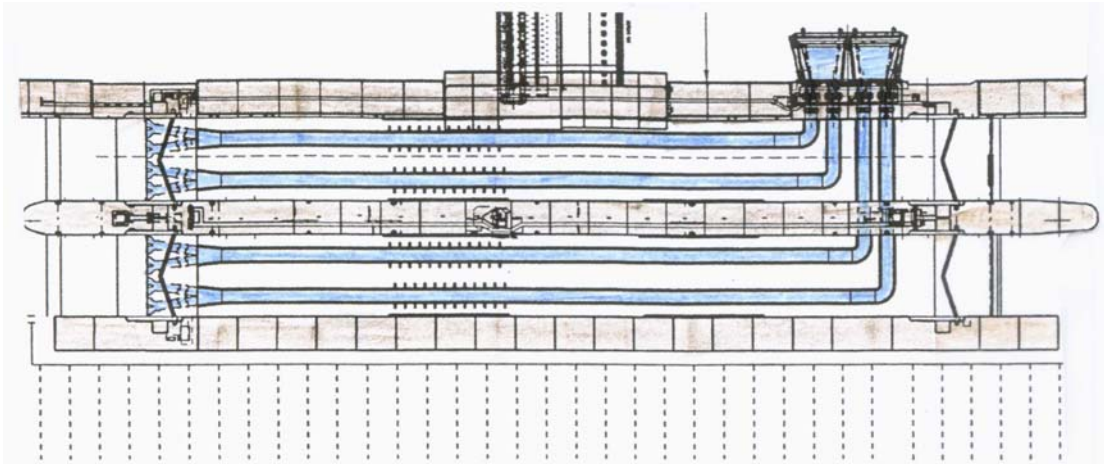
Plan view of existing Lock 4 after the river chamber stability struts are demolished
